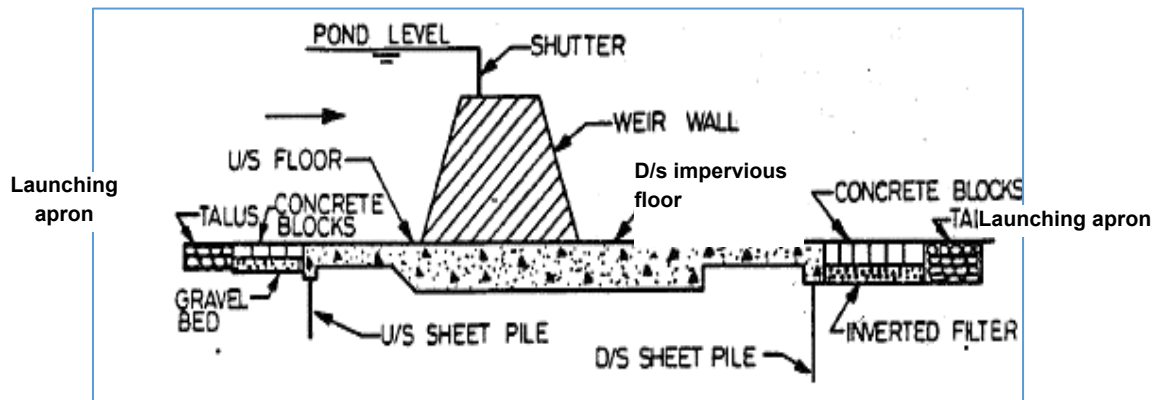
Arrangement of launching apron on horizontal floor (S.K. Garg, 2006)
